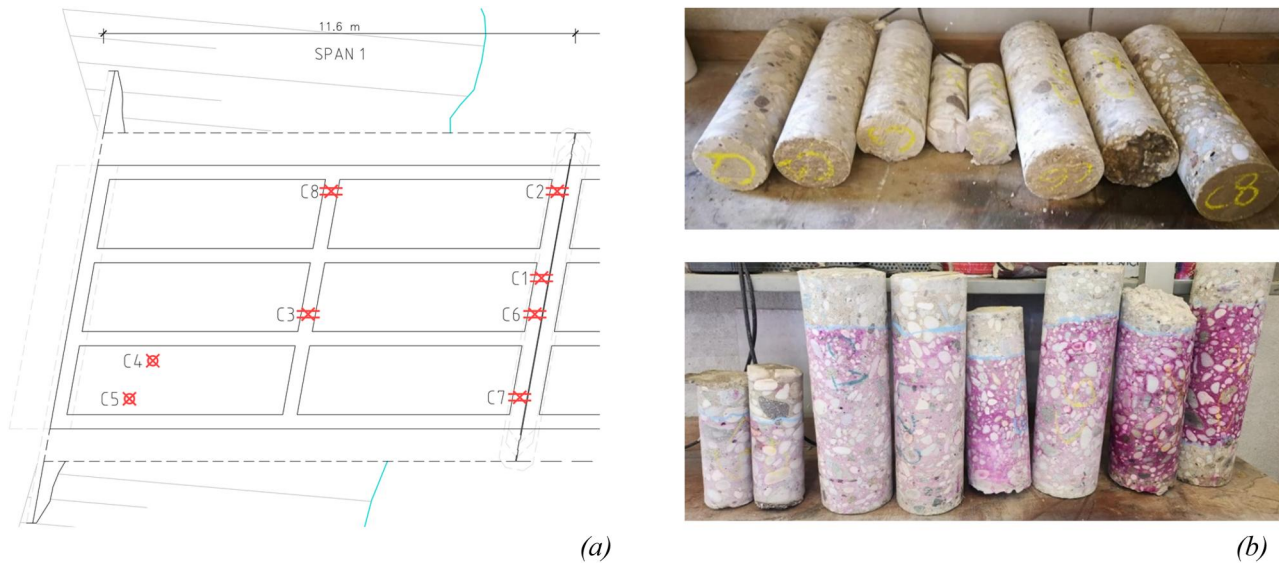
(a) Sampling points for concrete specimens along the bridge; (b) photos of the specimens.
